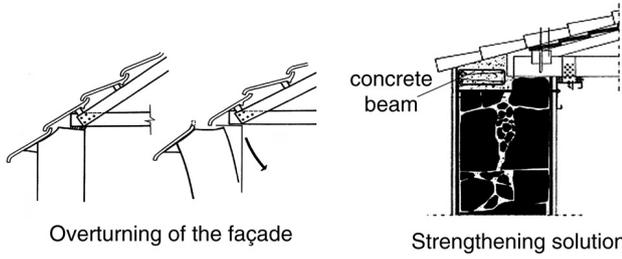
Usual strengthening solution adopted to prevent fall out-of-plane of façades ([5] and [6]).
